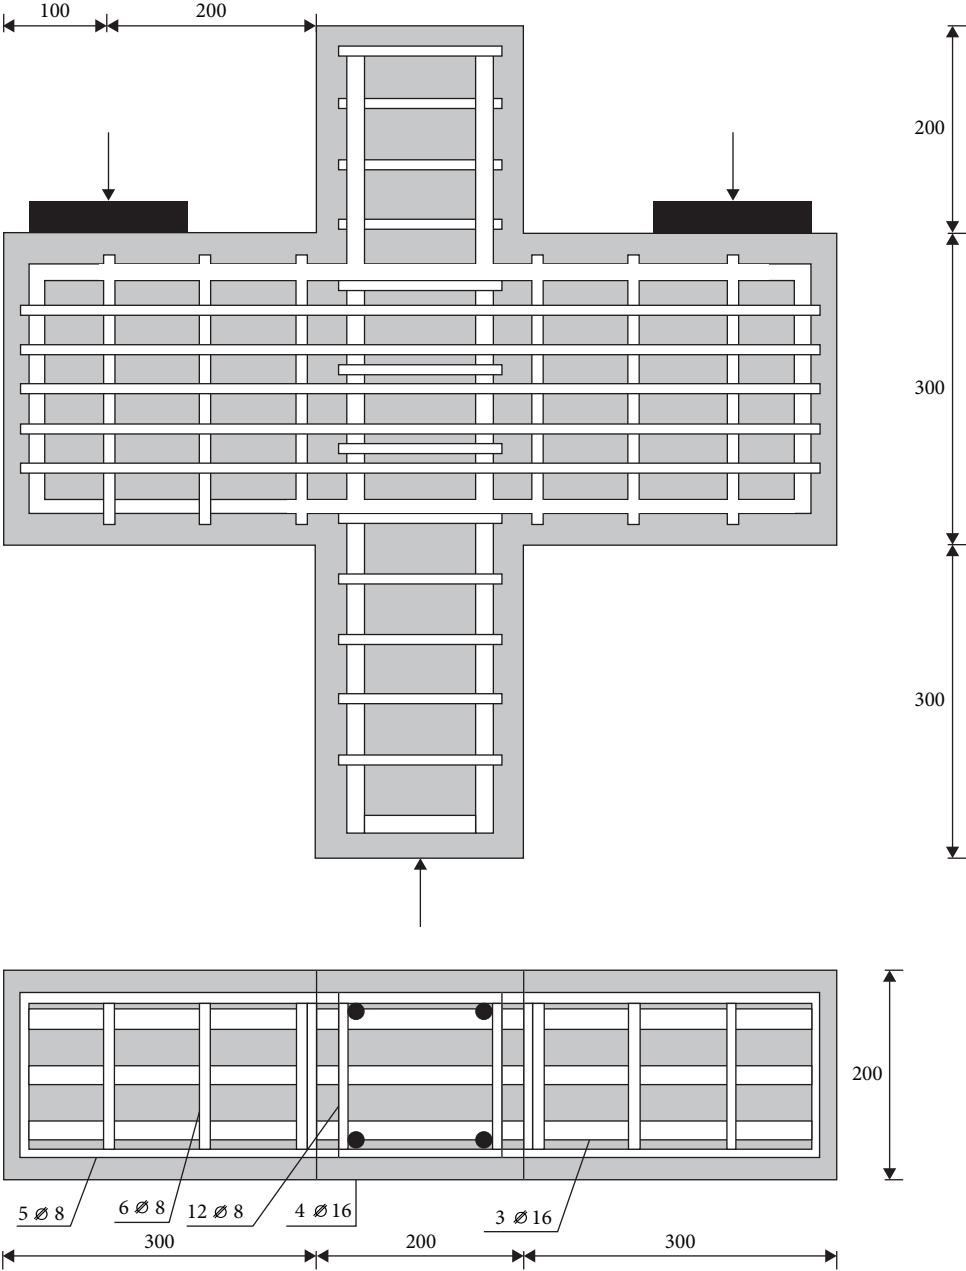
Reinforcement and geometric details of the tested corbel with respect to ECP [3] (units in mm).
